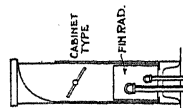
FIN-TYPE HEATING UNIT CONCEALED IN CABINET
